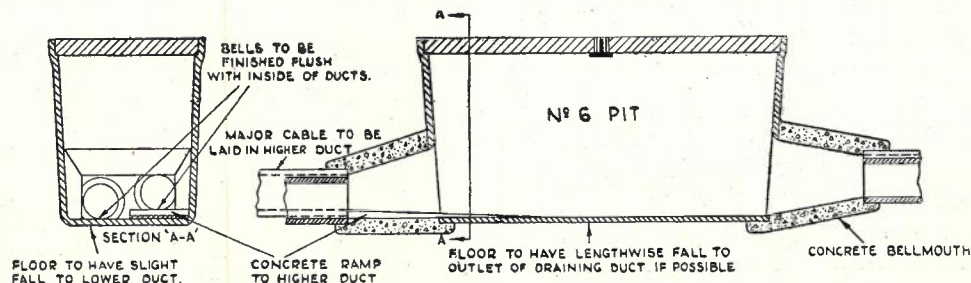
No. 6 Pit, with Concrete Bellmouths.
